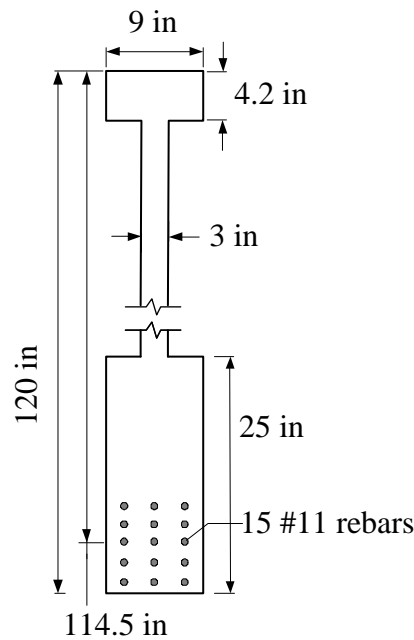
Section dimension and arrangement of longitudinal reinforcement steel rebars for section UHP/St60 120I-2
